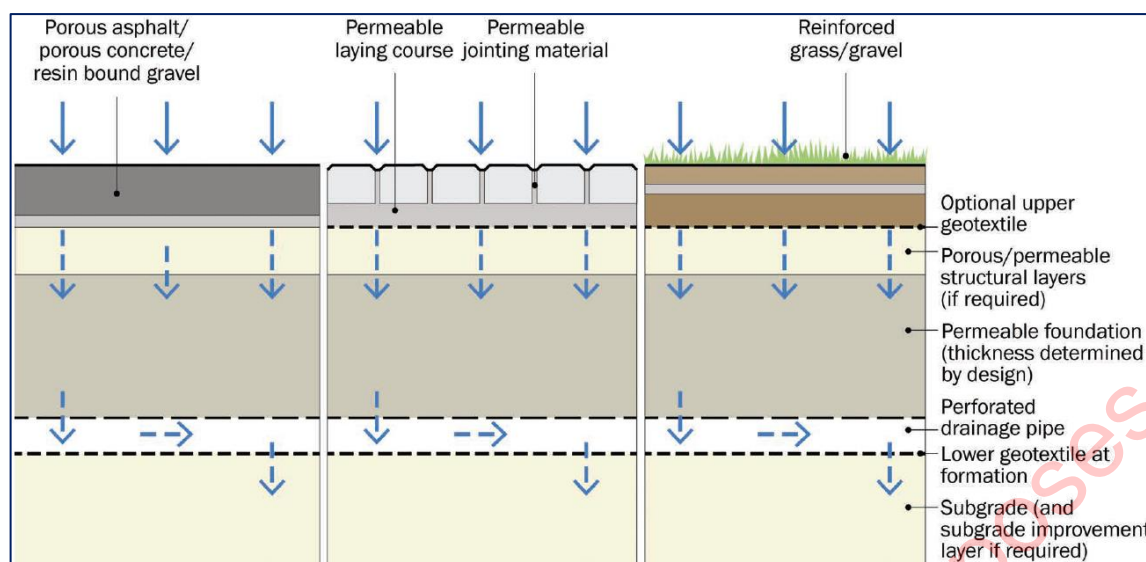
Detail of Type B Pervious Paving (CIRIA C753)
